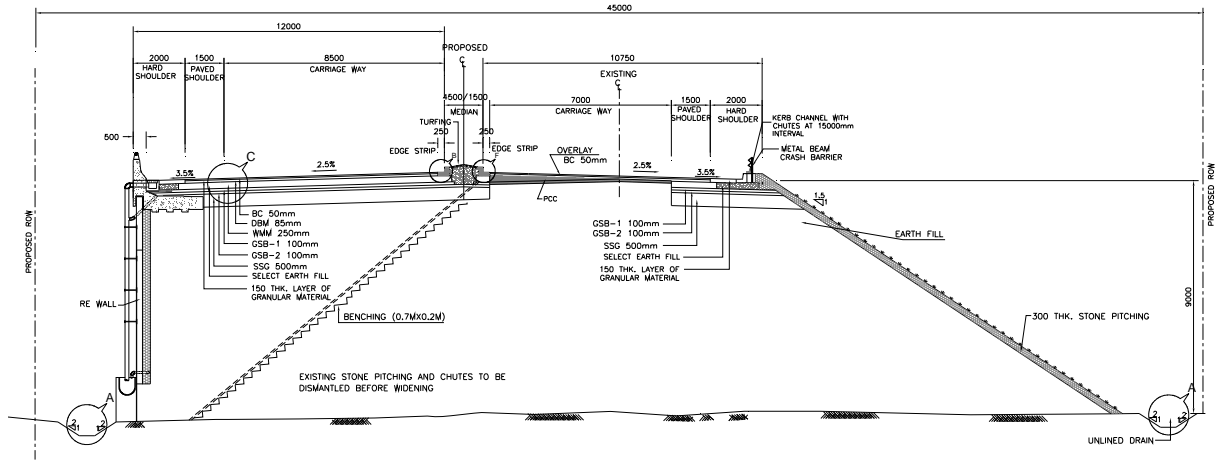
TYPICAL CROSS SECTION FOR WIDENING OF EXISTING SECTION AT ROB
